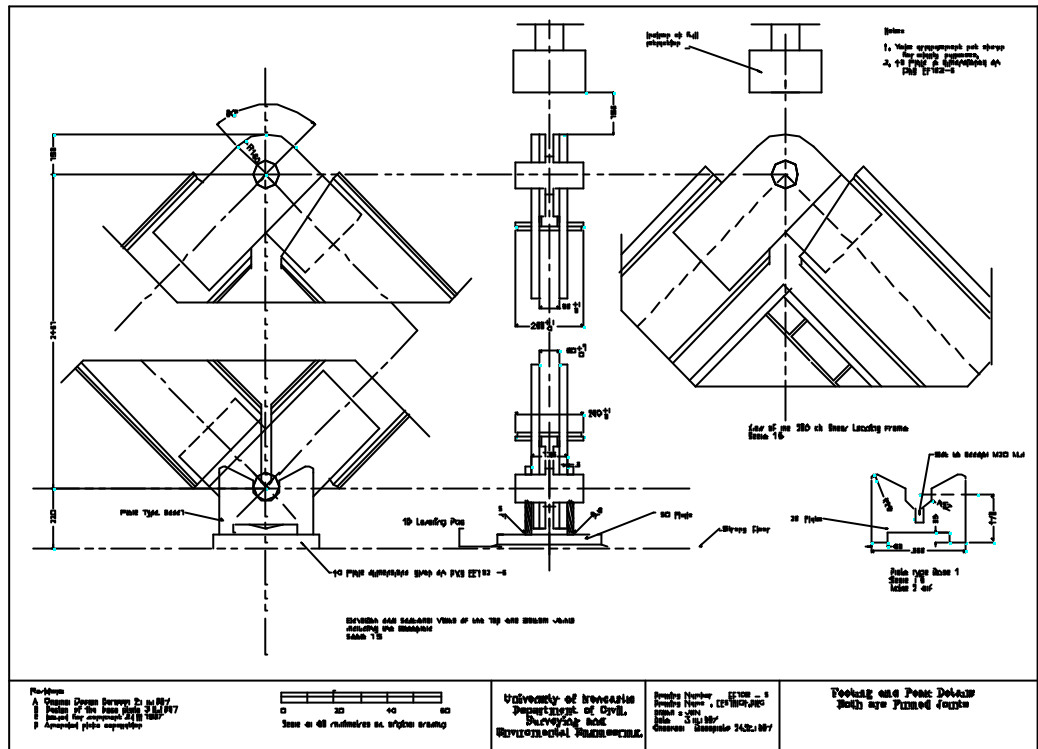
EF102 - 5 FOOTING AND PEAK DETAILS, PINNED JOINTS
